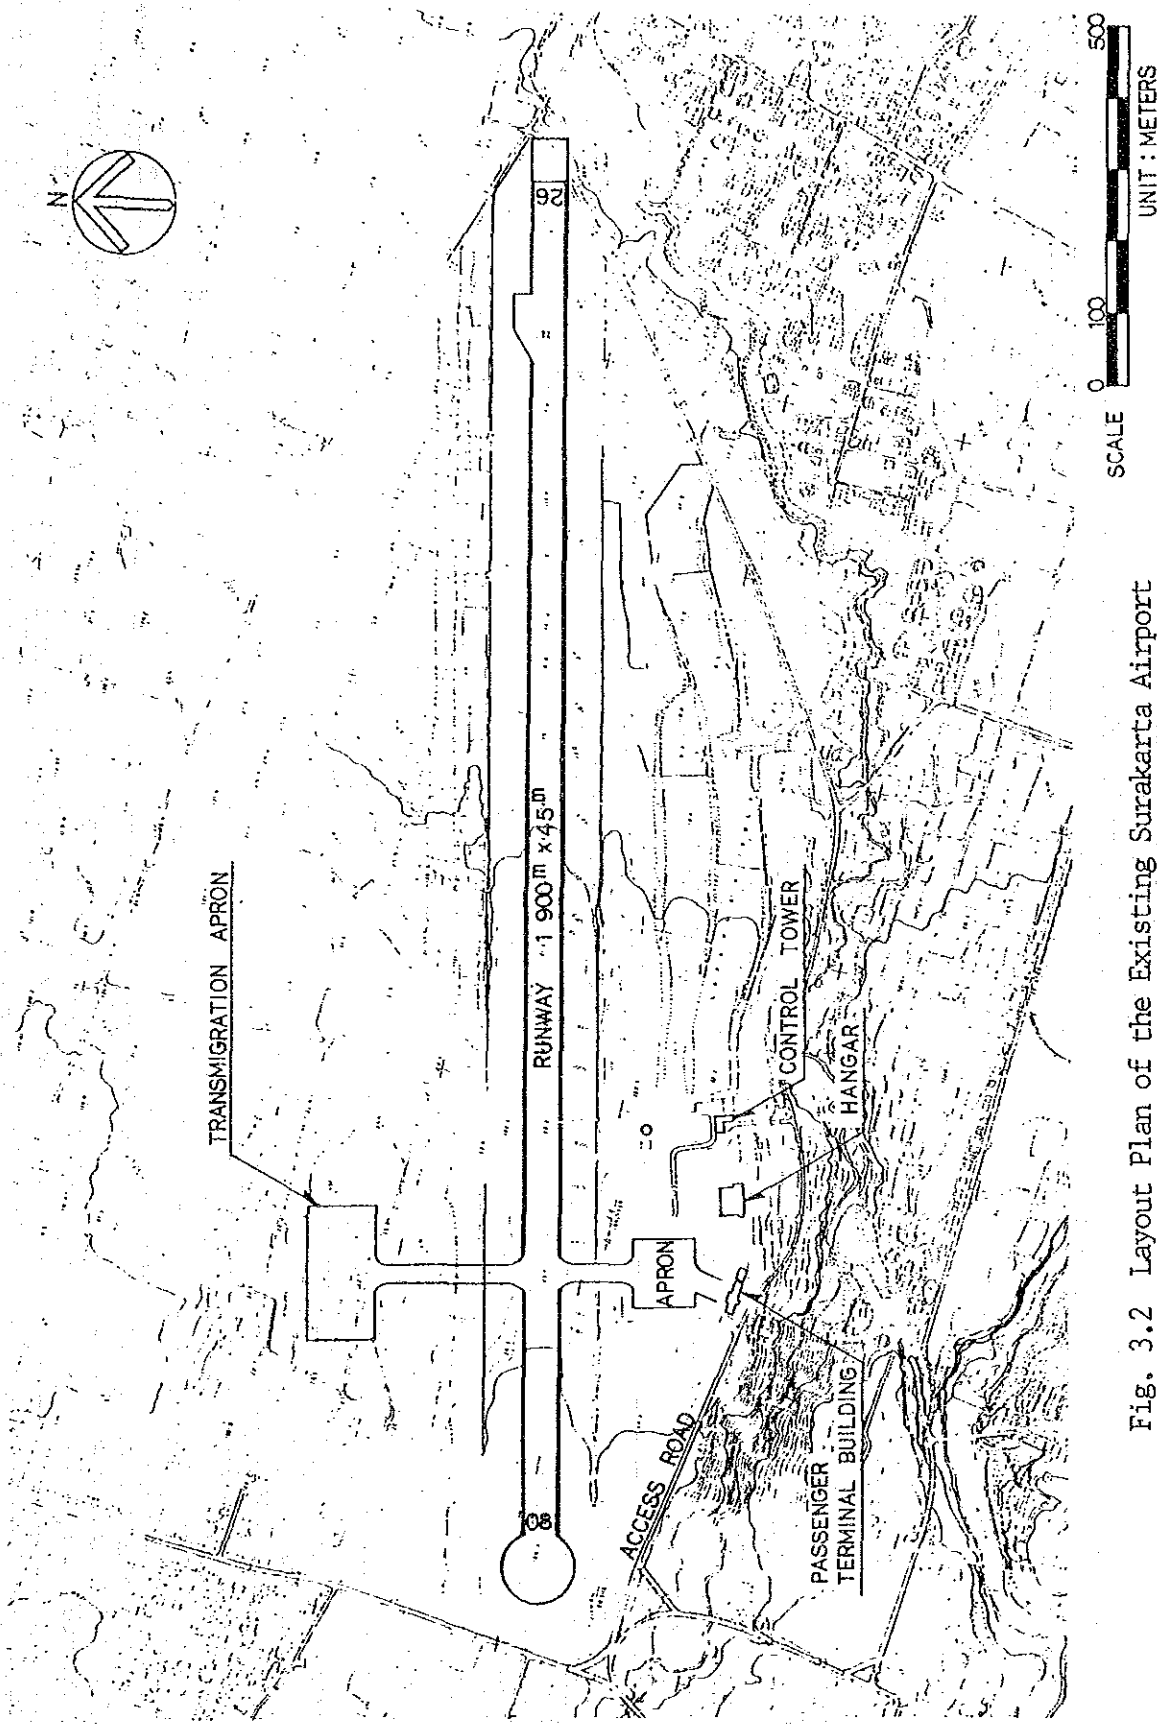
Layout Plan of the Existing Surakarta Airport
